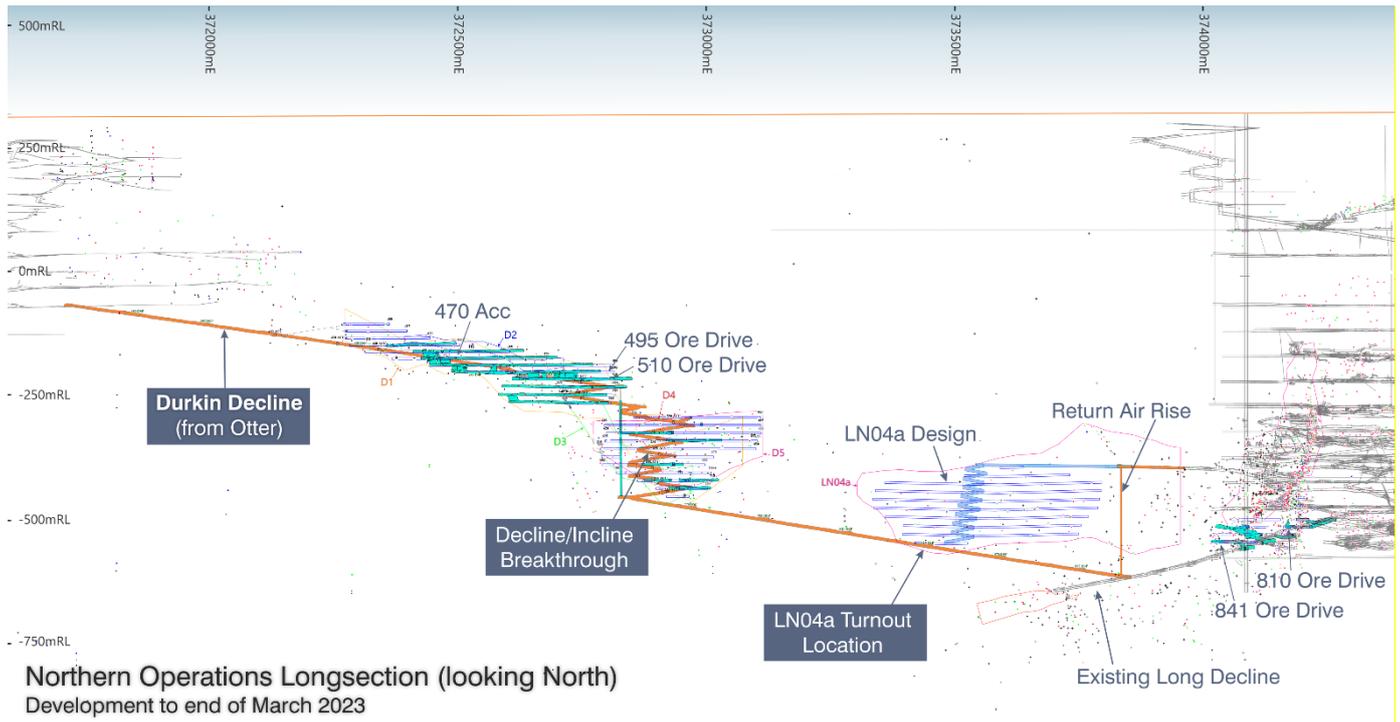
Durkin North Mine Plan Design (Long Section Looking North). Development as of March quarter end 2023.
